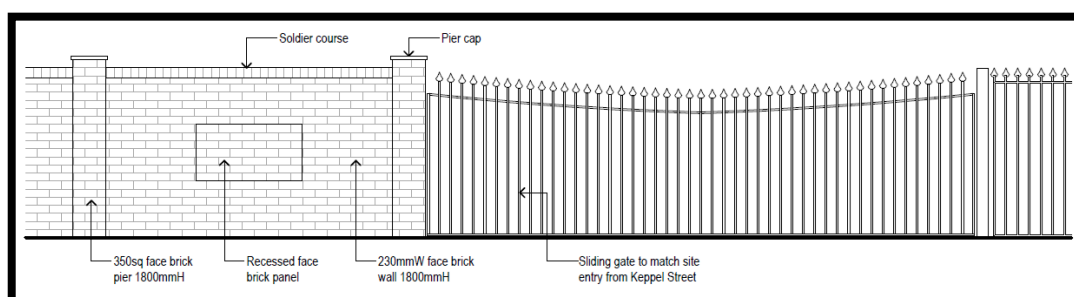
Elevation Plan – Proposed 1.925m High Facebrick Fence with a Sliding Metal Spear Top Gate – North-Western Boundary Fronting Manilla Street – Lot 11 DP 1266801
